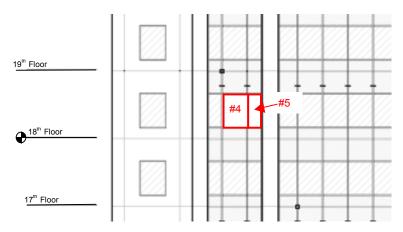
Partial West Elevation – Vision glass (#4 & #5) observed with surface cracks on May 1, 2012
